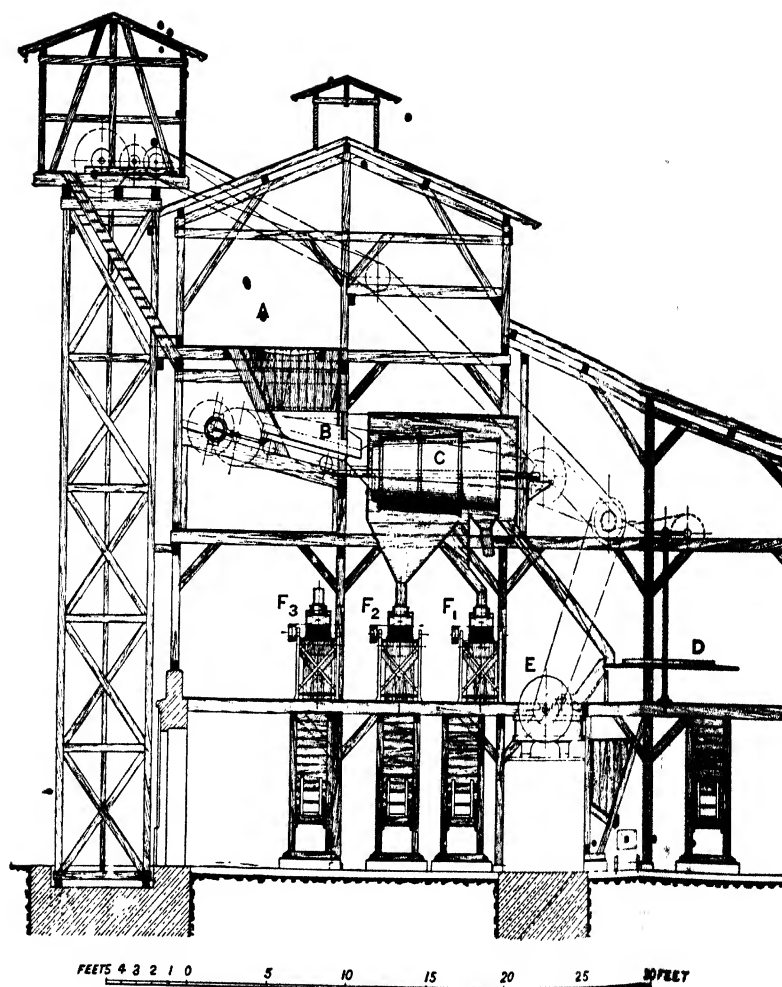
Sigsbee magnetic separator plant. Sectional elevation.
